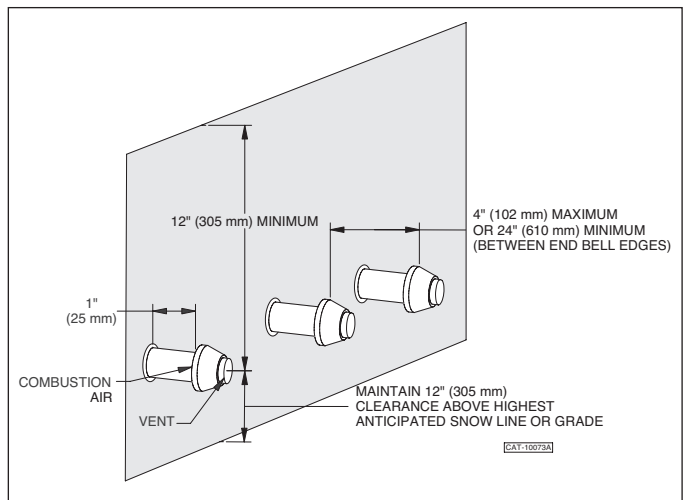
Horizontal Sidewall Concentric Venting, Multiple Unit Horizontal Layout
